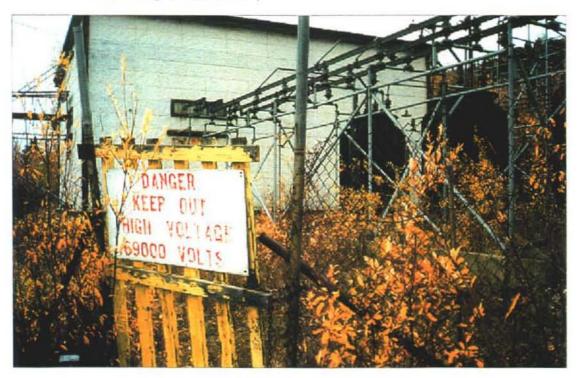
Elsa. Electrical Equipment Area #5, transformers beside the adit portal.
